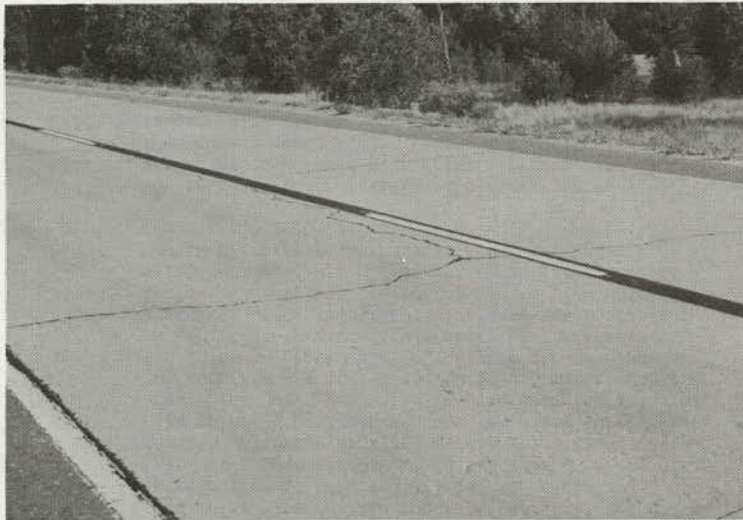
Cracking from Improper Joint Construction (Cracking is at a location where a joint should have been saw cut.) (Picture is of a jointed-plain concrete pavement.)
